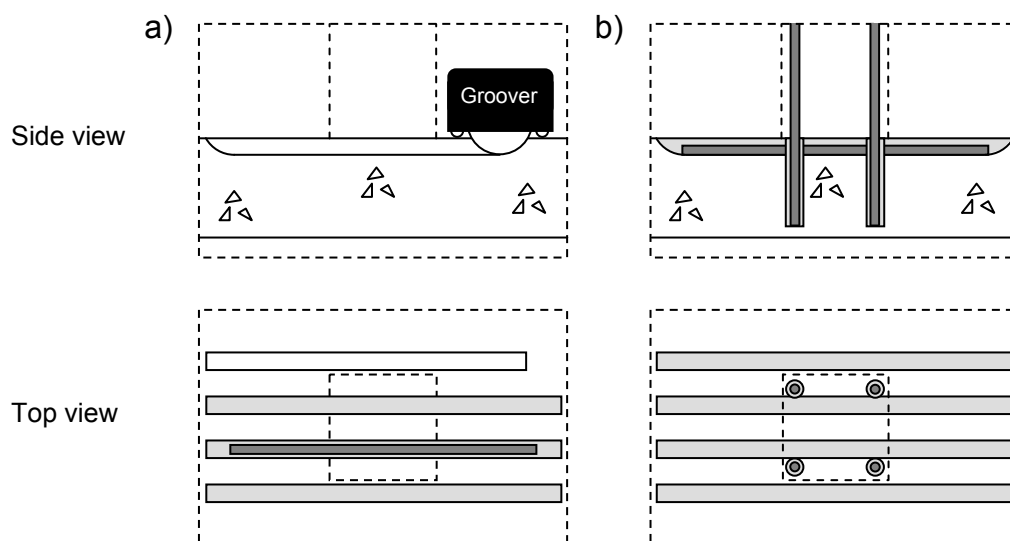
a) Post-installation of near-surface reinforcement; b) Post-installation of column starter bars
